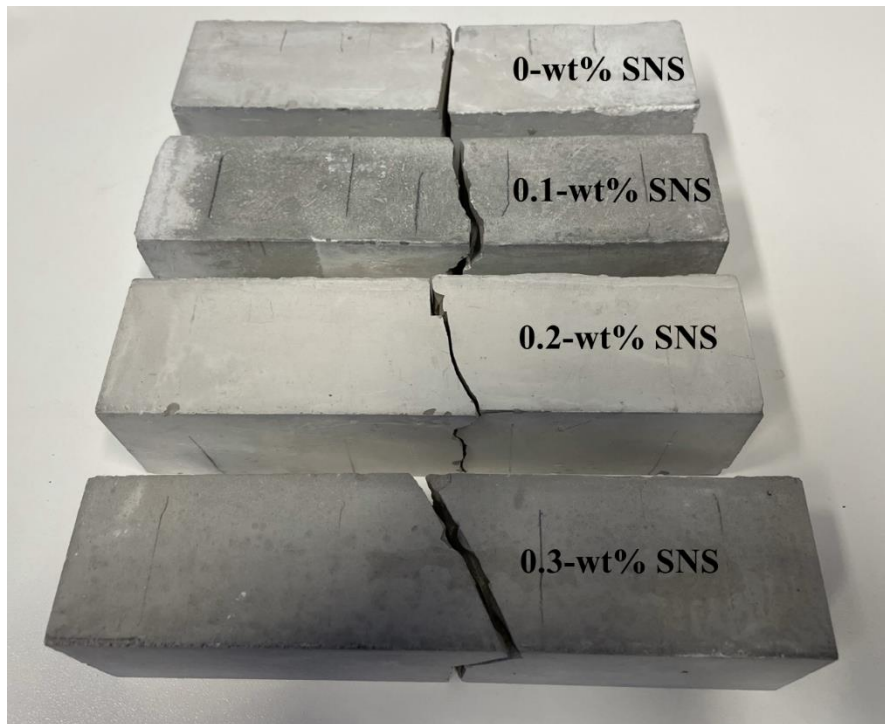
Failure modes showing crack deflection mechanism in SNS reinforced cement prisms.
